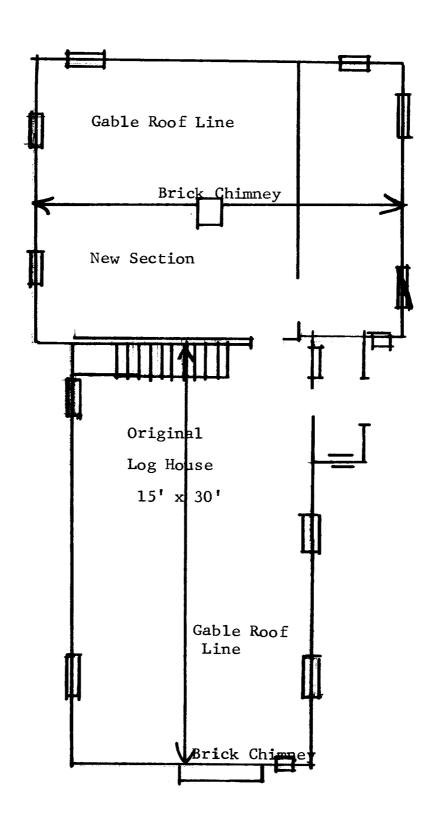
Ho - 435 Gerald Hopkin's Log House First: Floor Plan
